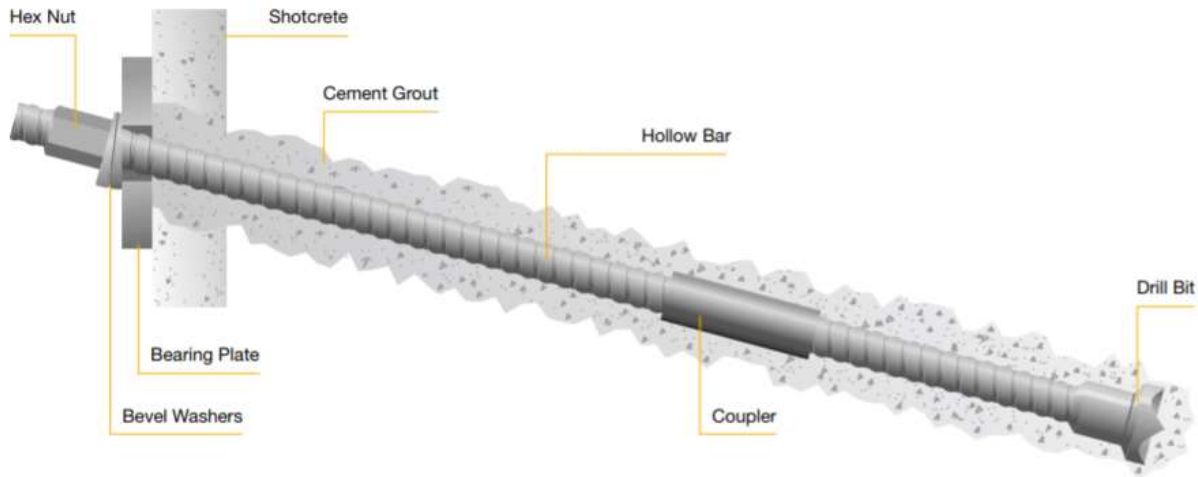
Typical Cross Section of a Hollow Core Soil Nail
